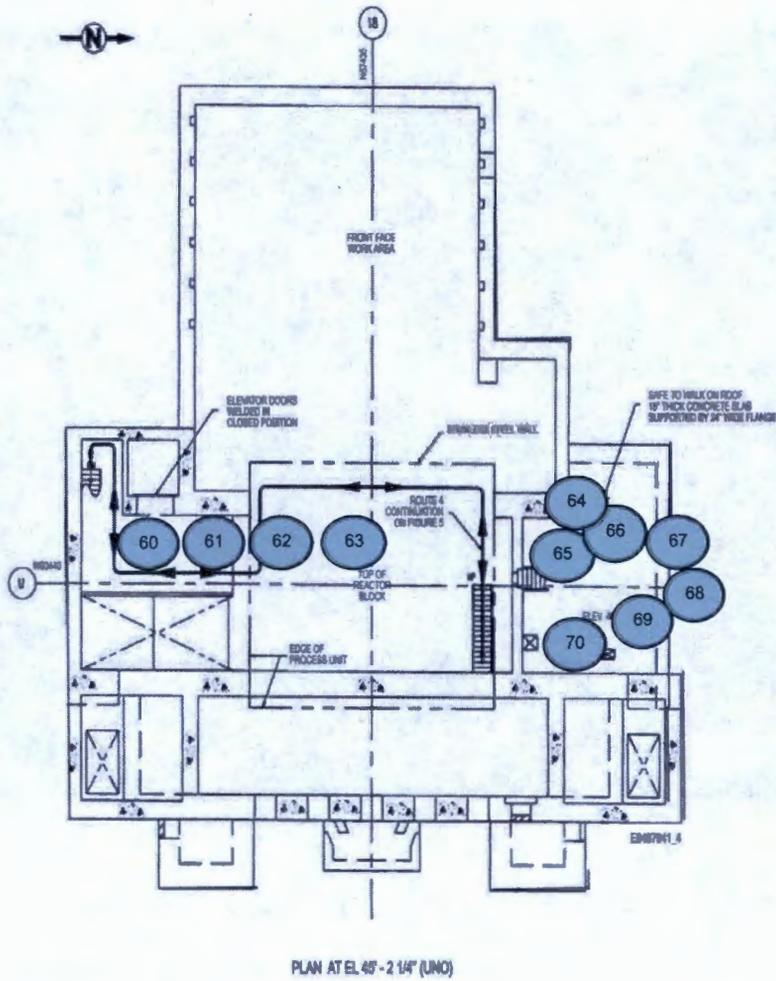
ISS Structural Details Elevation 45'-2 1/4".
